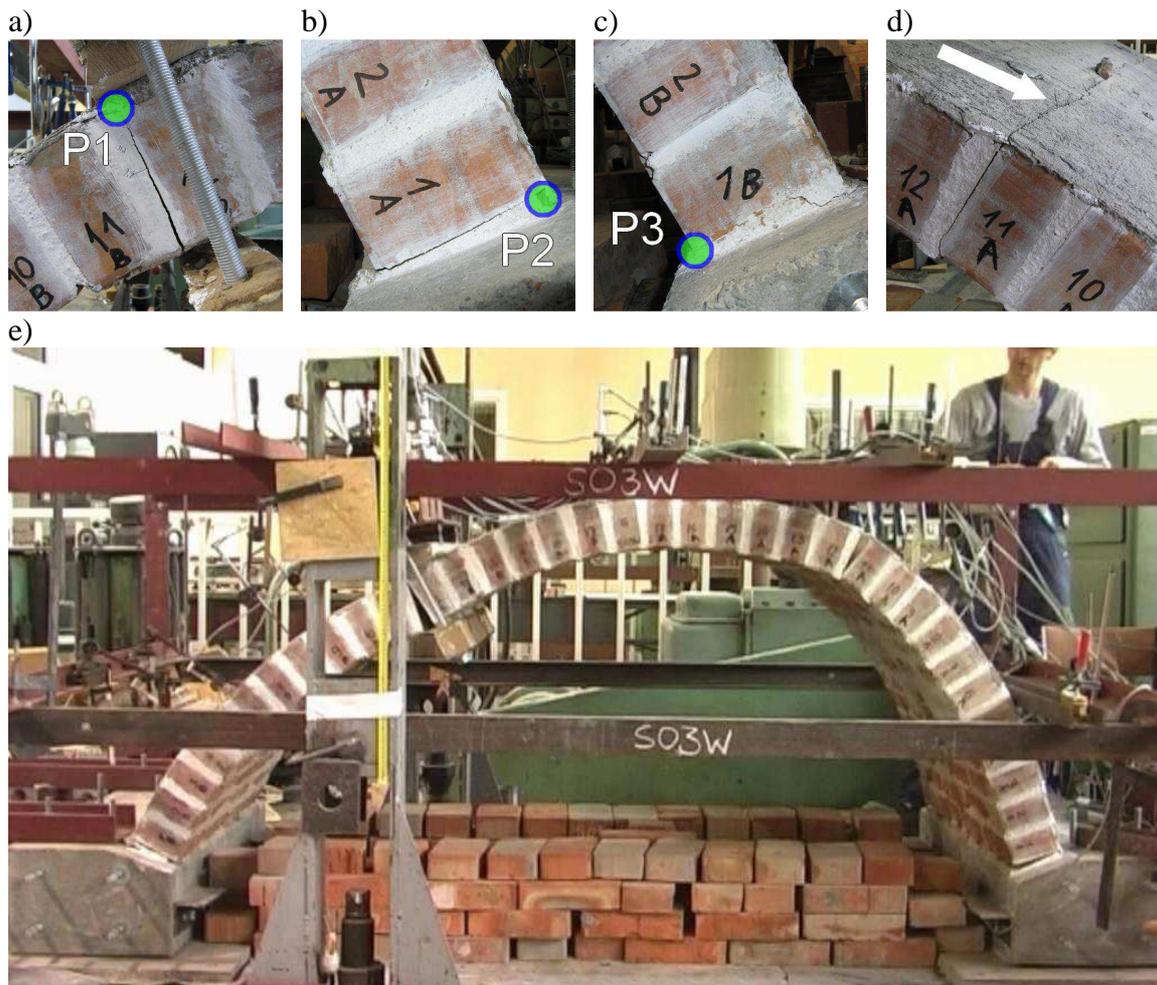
Vault VG2 (originally named S03W): a)-c) cracks and hinges developed, d) crack at the extrados – ruptured glass fibers, e) failure mechanism.
